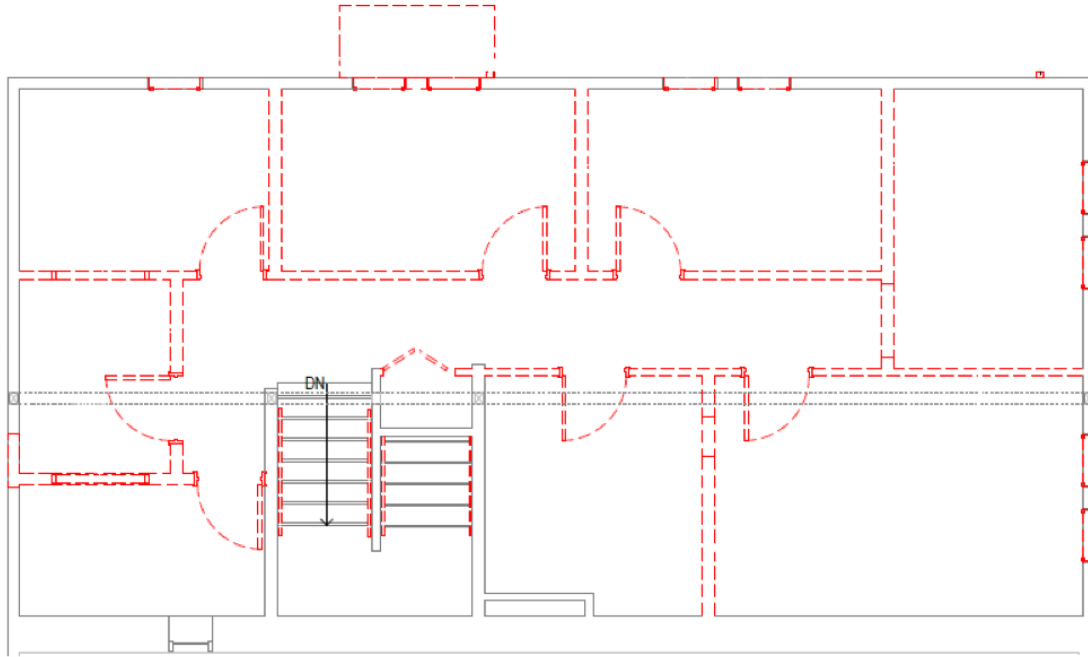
Demolition plan, second story addition, showing removal of non-original/character-defining walls. Plans courtesy of ORW Architecture. November 2022.
